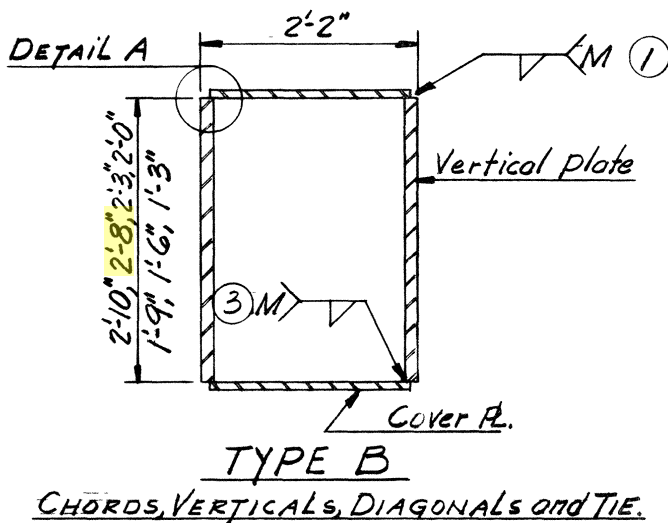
Type B bridge elements including tie girder section from design drawings (depth highlighted in yellow).
